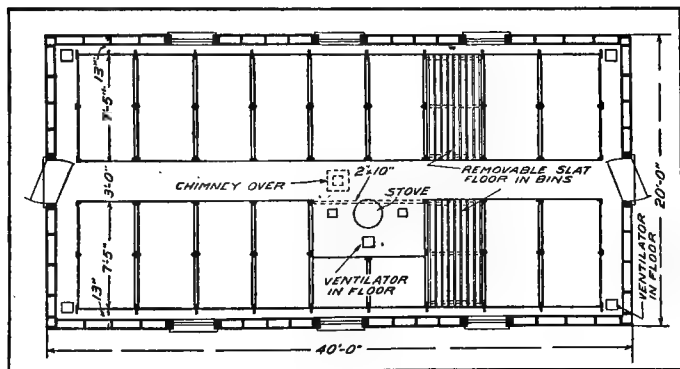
Floor plan of a 20 by 40 foot sweet potato storage-house having a capacity of 2,000 to 2,500 bushels.
